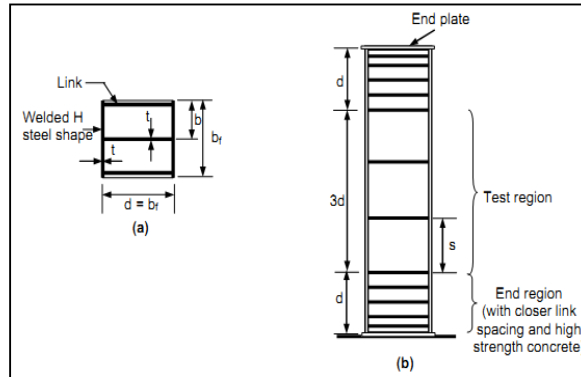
Typical PEC Test Column, (a) Cross-section, (b) Elevation
